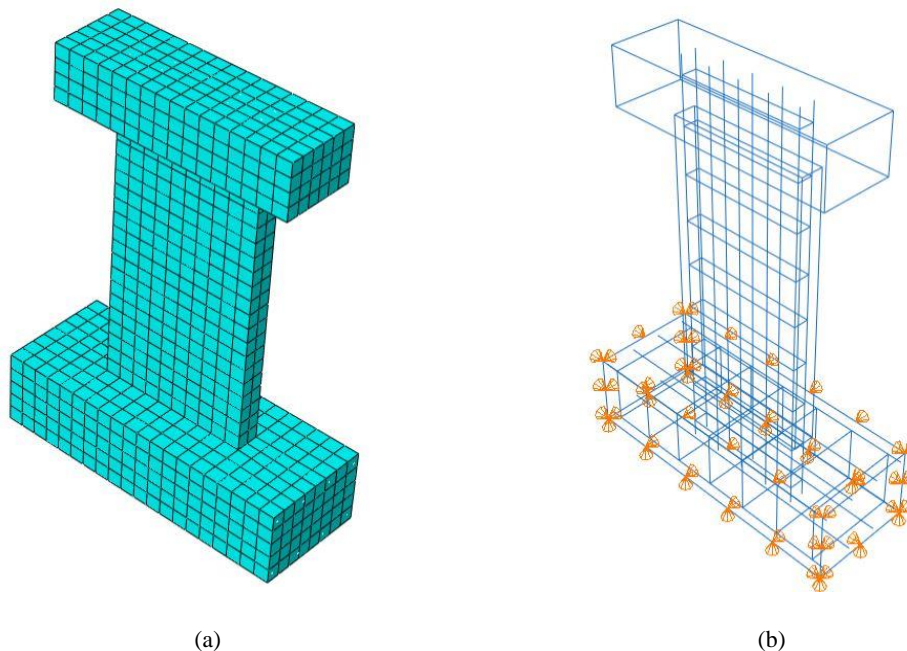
Schematic view of RC shear wall: (a) wall mesh pattern; (b) reinforcements arrangements and support condition.
